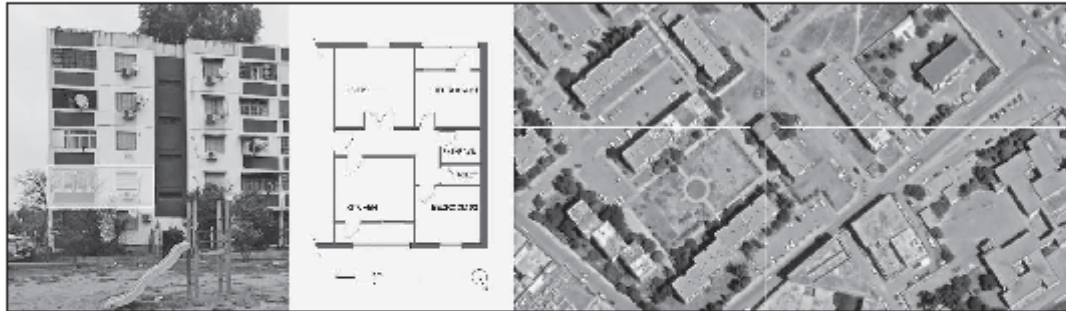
CASE STUDY BUILDING: (A) CASE STUDY BUILDING FACADE REAL PICTURE, (B) PLAN OF THE CASE STUDY APARTMENT, (C) SITE PLAN WITH CASE STUDY BUILDING LOCATED
